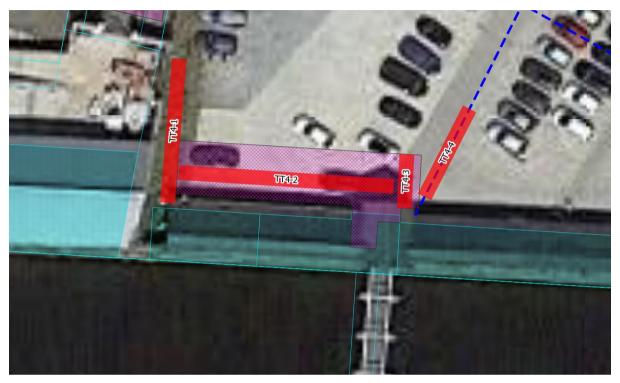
Proposed test trenches in Area 4 – TT4-1 to TT4-4.
